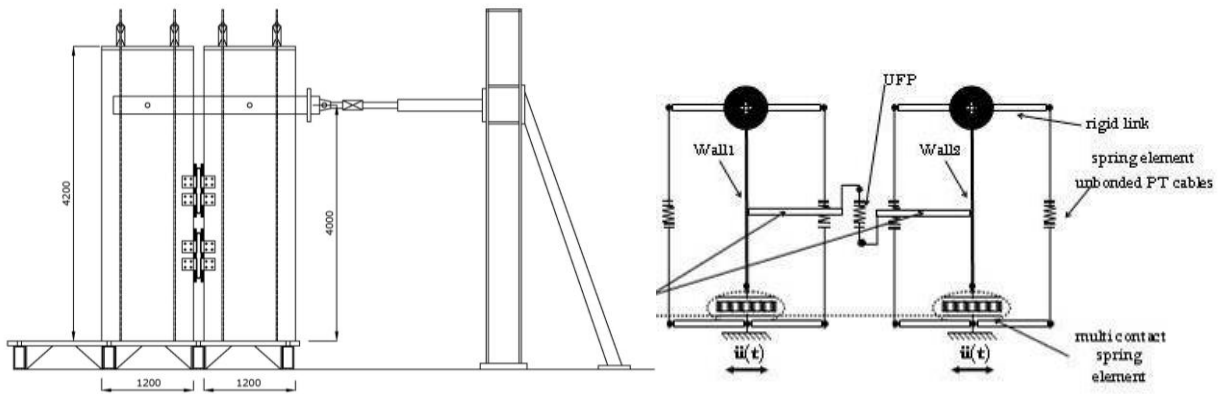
CLT coupled wall-foundation test specimen (left) and numerical model (right)
